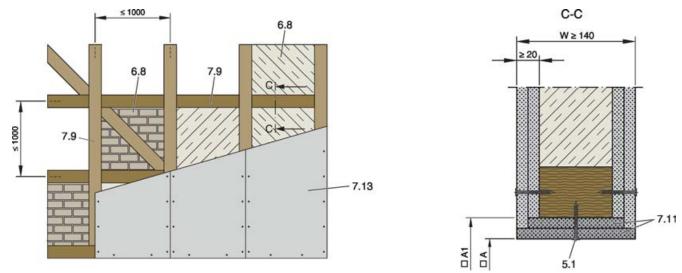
Lightweight partition wall with half-timbered construction and cladding on both sides
